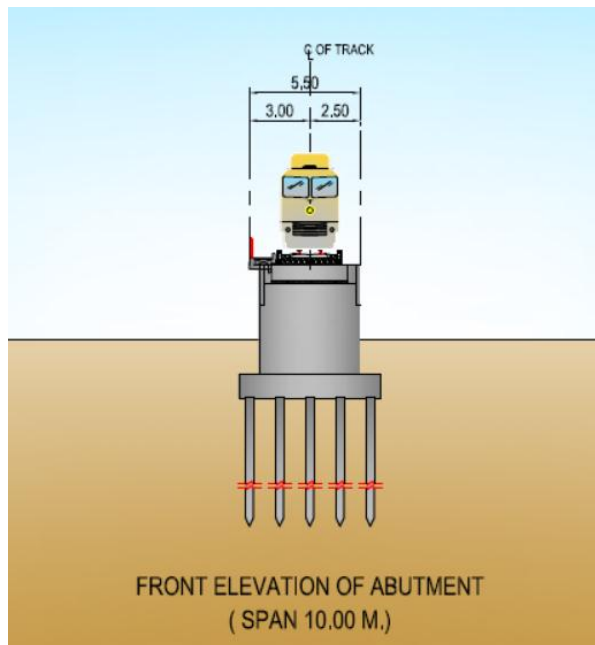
The Bridge Structure with Cast In-Situ Reinforced Concrete Slabs
